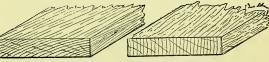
Fig. 791.—Butt Heading Joint in Floor Brad. Floor.
